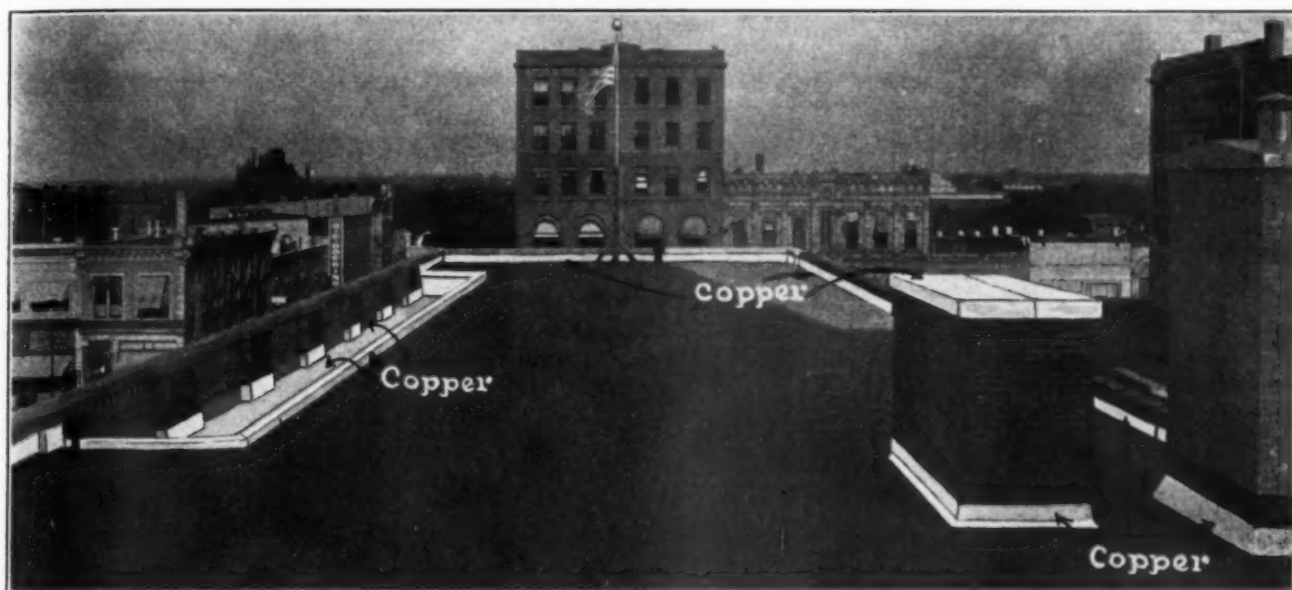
Roof of Central National Bank Building, Topeka, Kansas, Showing How and Where Copper was Used in Loose Trough Gutters
